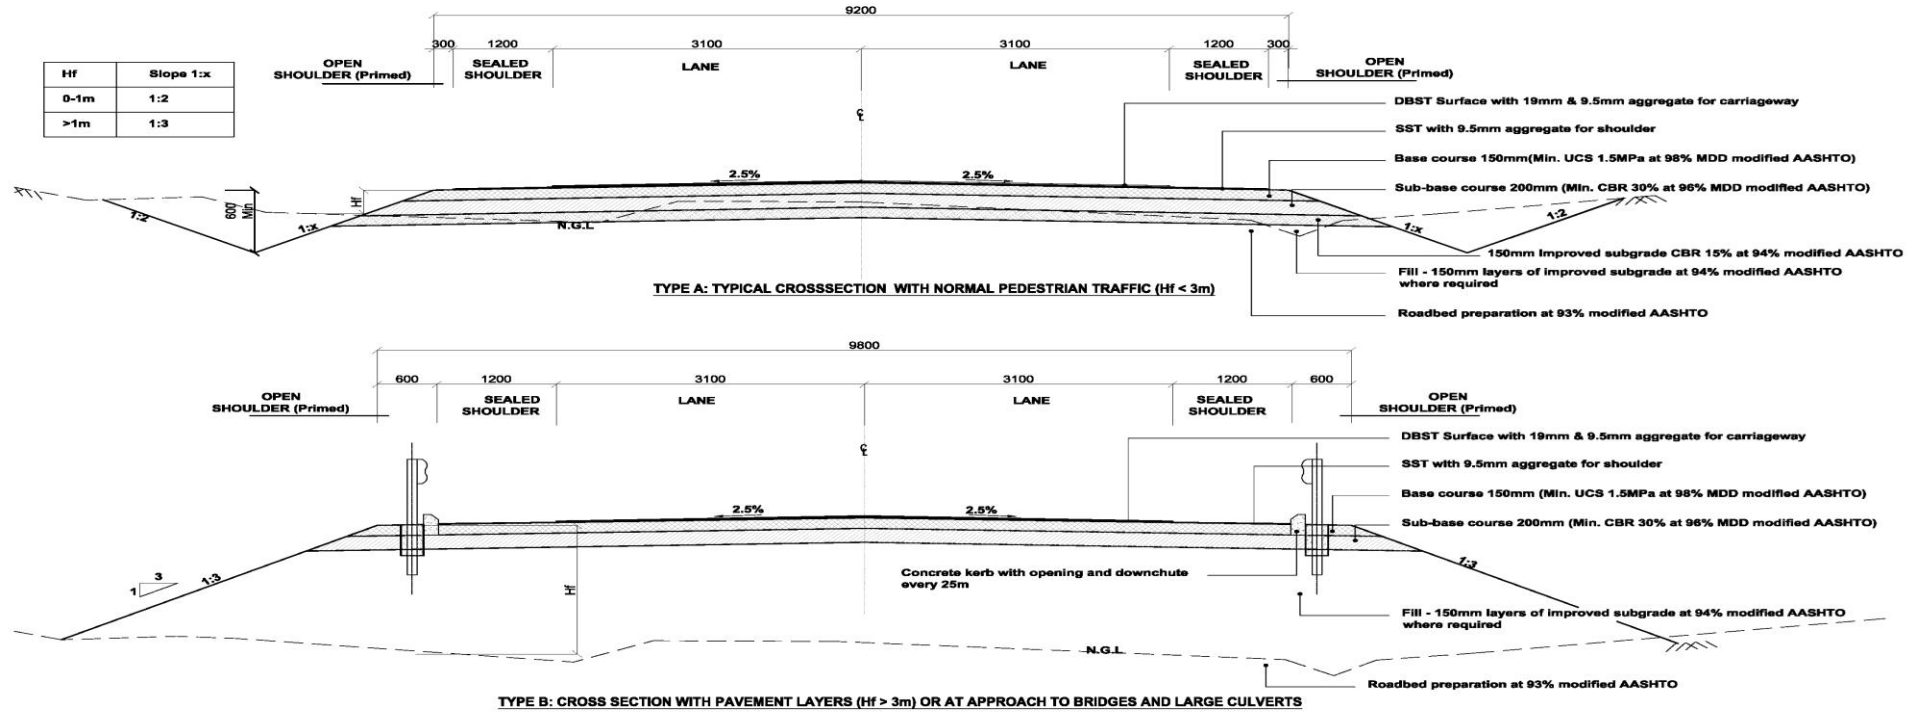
Typical Cross Section for the proposed Manyinga to Jimbe Road Upgrade
